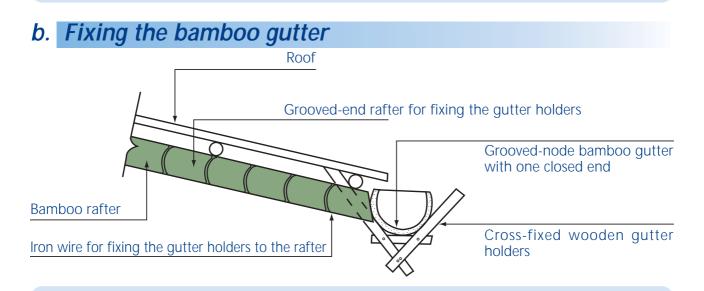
Fix the bamboo gutter to the bamboo roof structure using cross-fixed wooden gutter holders.
